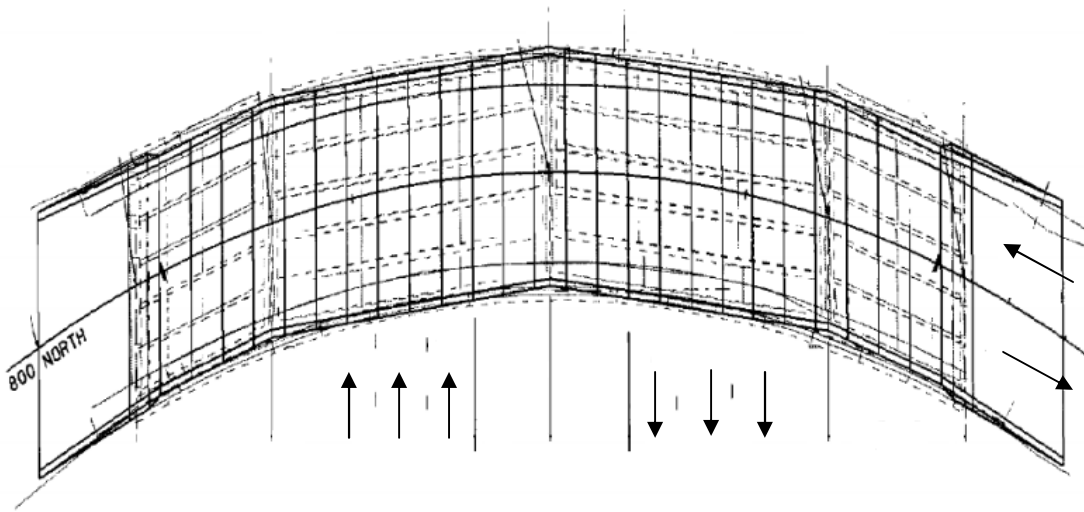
I-15/8th North Bridge layout (UDOT, 2006).
